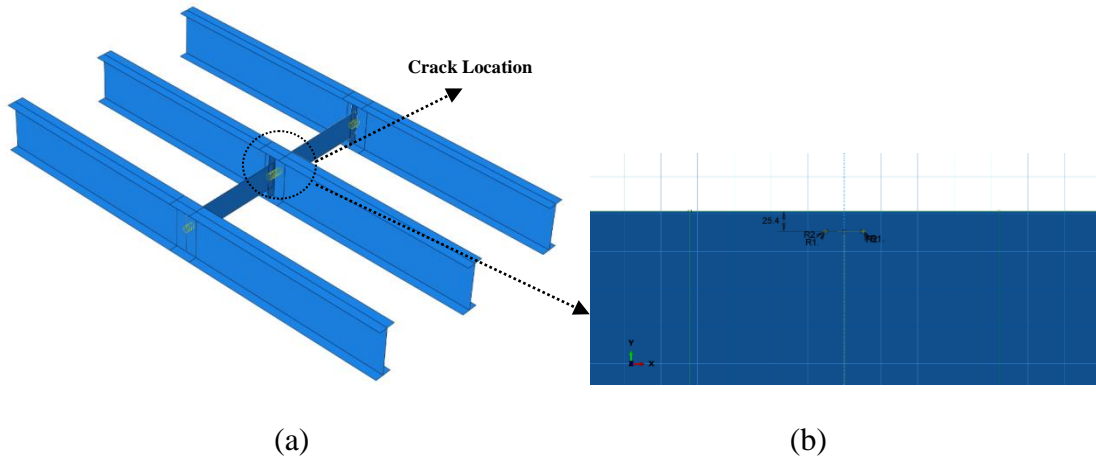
(a) Assembly of the girder model for the fatigue analysis (b) crack location and properties
